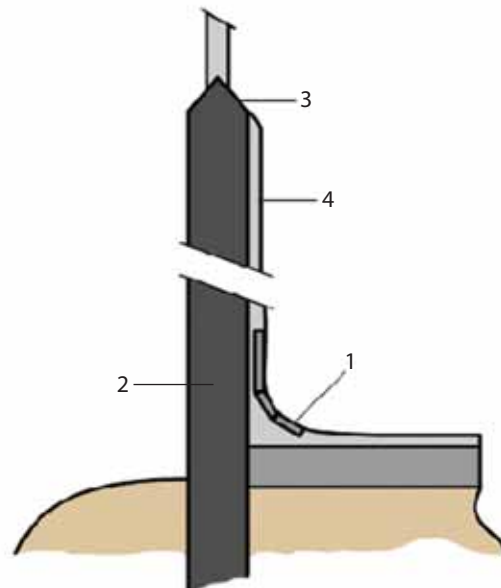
Floor and wall finishing, with corners covered in tile segments (1), smooth, hard and impermeable exterior finish (2), wall ledges inclined at 45° (3), and hygienically-surfaced interiors (4) (PAES 2002). The height of the wall surfacing should be appropriate to operations
